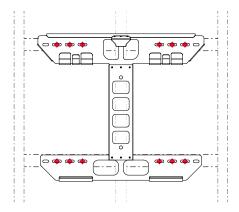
Anchoring the Bracket to Metal Backing - High Wind Area
